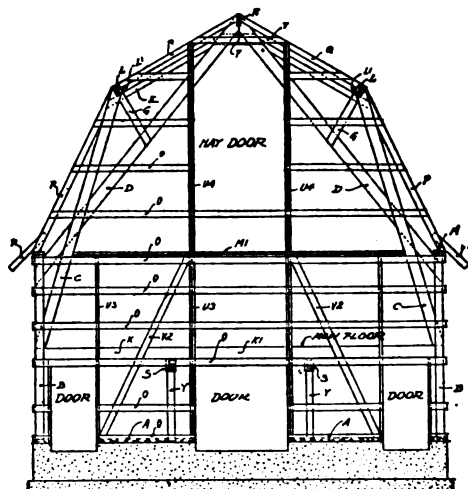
End framing of a barn 36 feet wide with 16-foot side walls, built according to the plank-truss type of construction.
